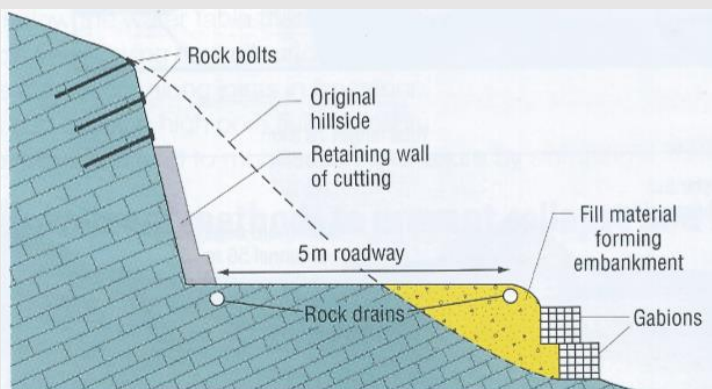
Ground improvement strategies used to stabilise cuttings and embankments.
